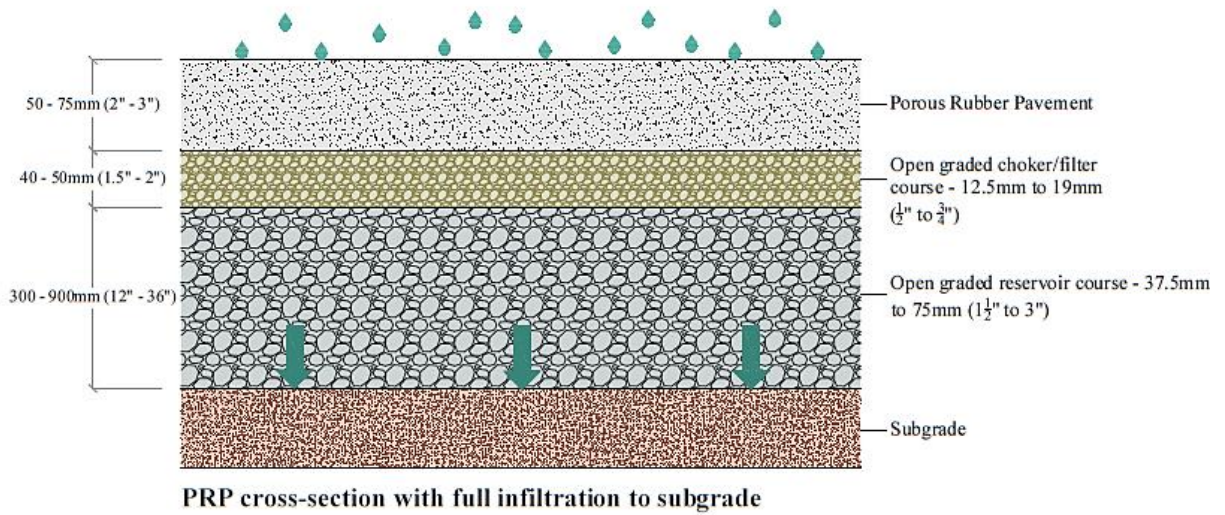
Typical cross-section of PRP with full infiltration to subgrade
